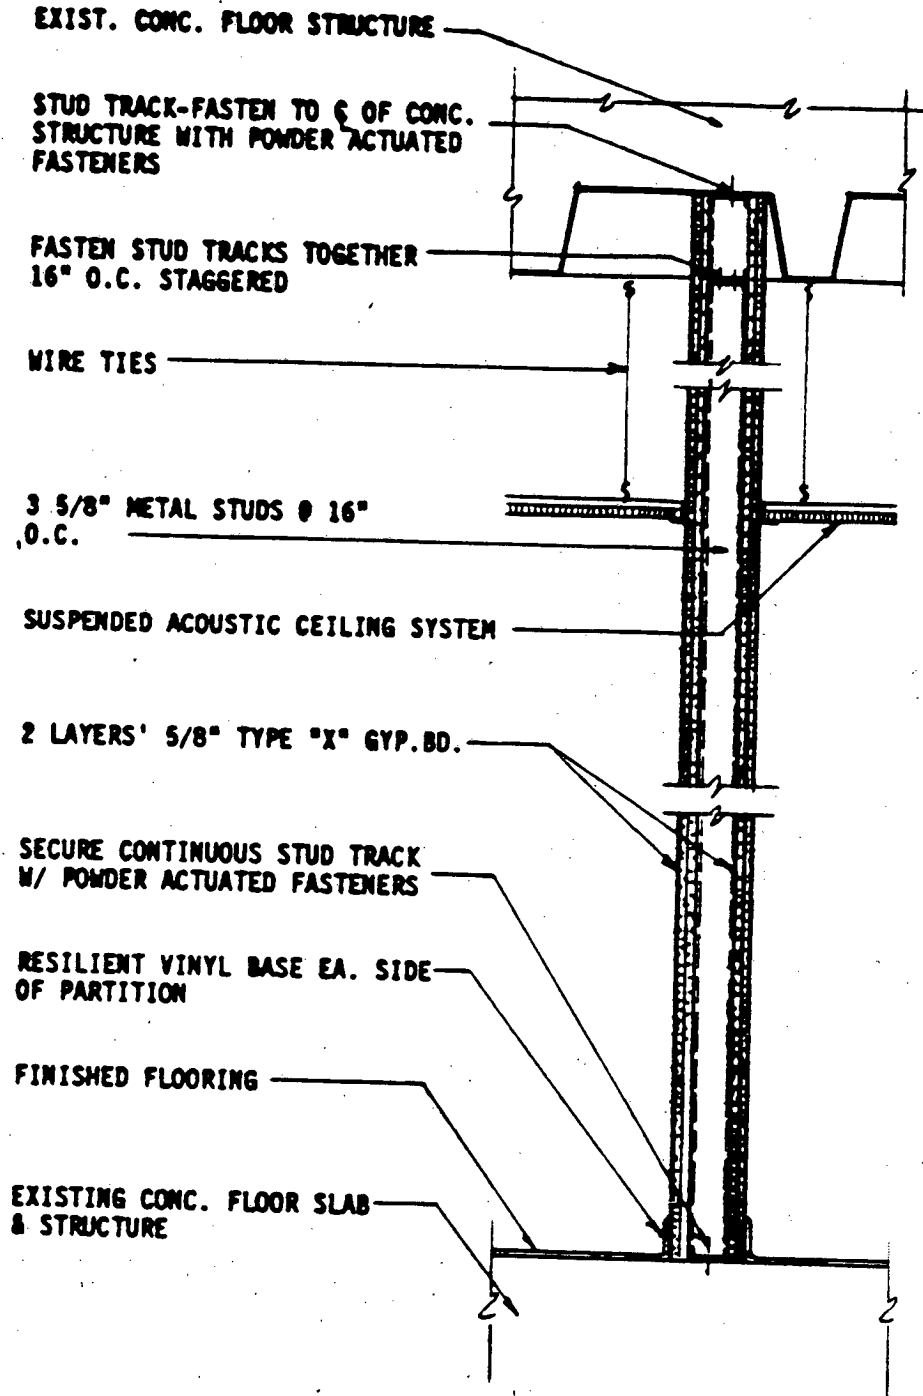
TWO HOUR FIRE RATED WALL CROSECTION
